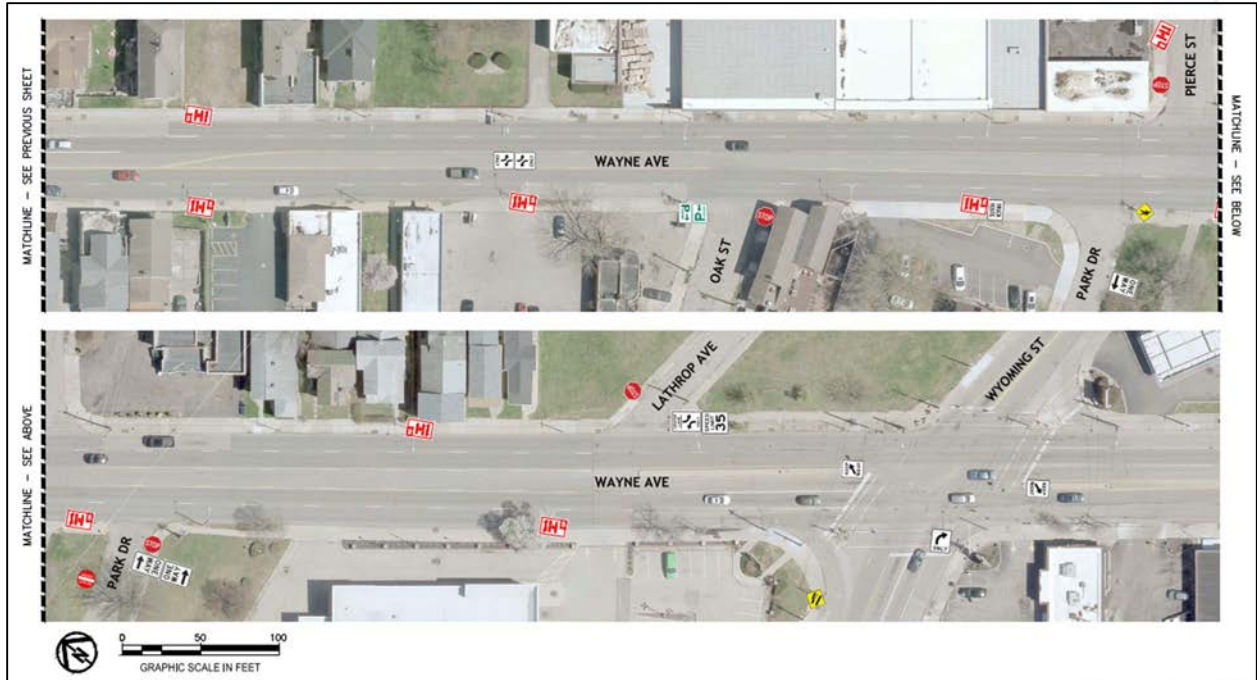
Existing Traffic Control (2) Clover Street to Wyoming Street
